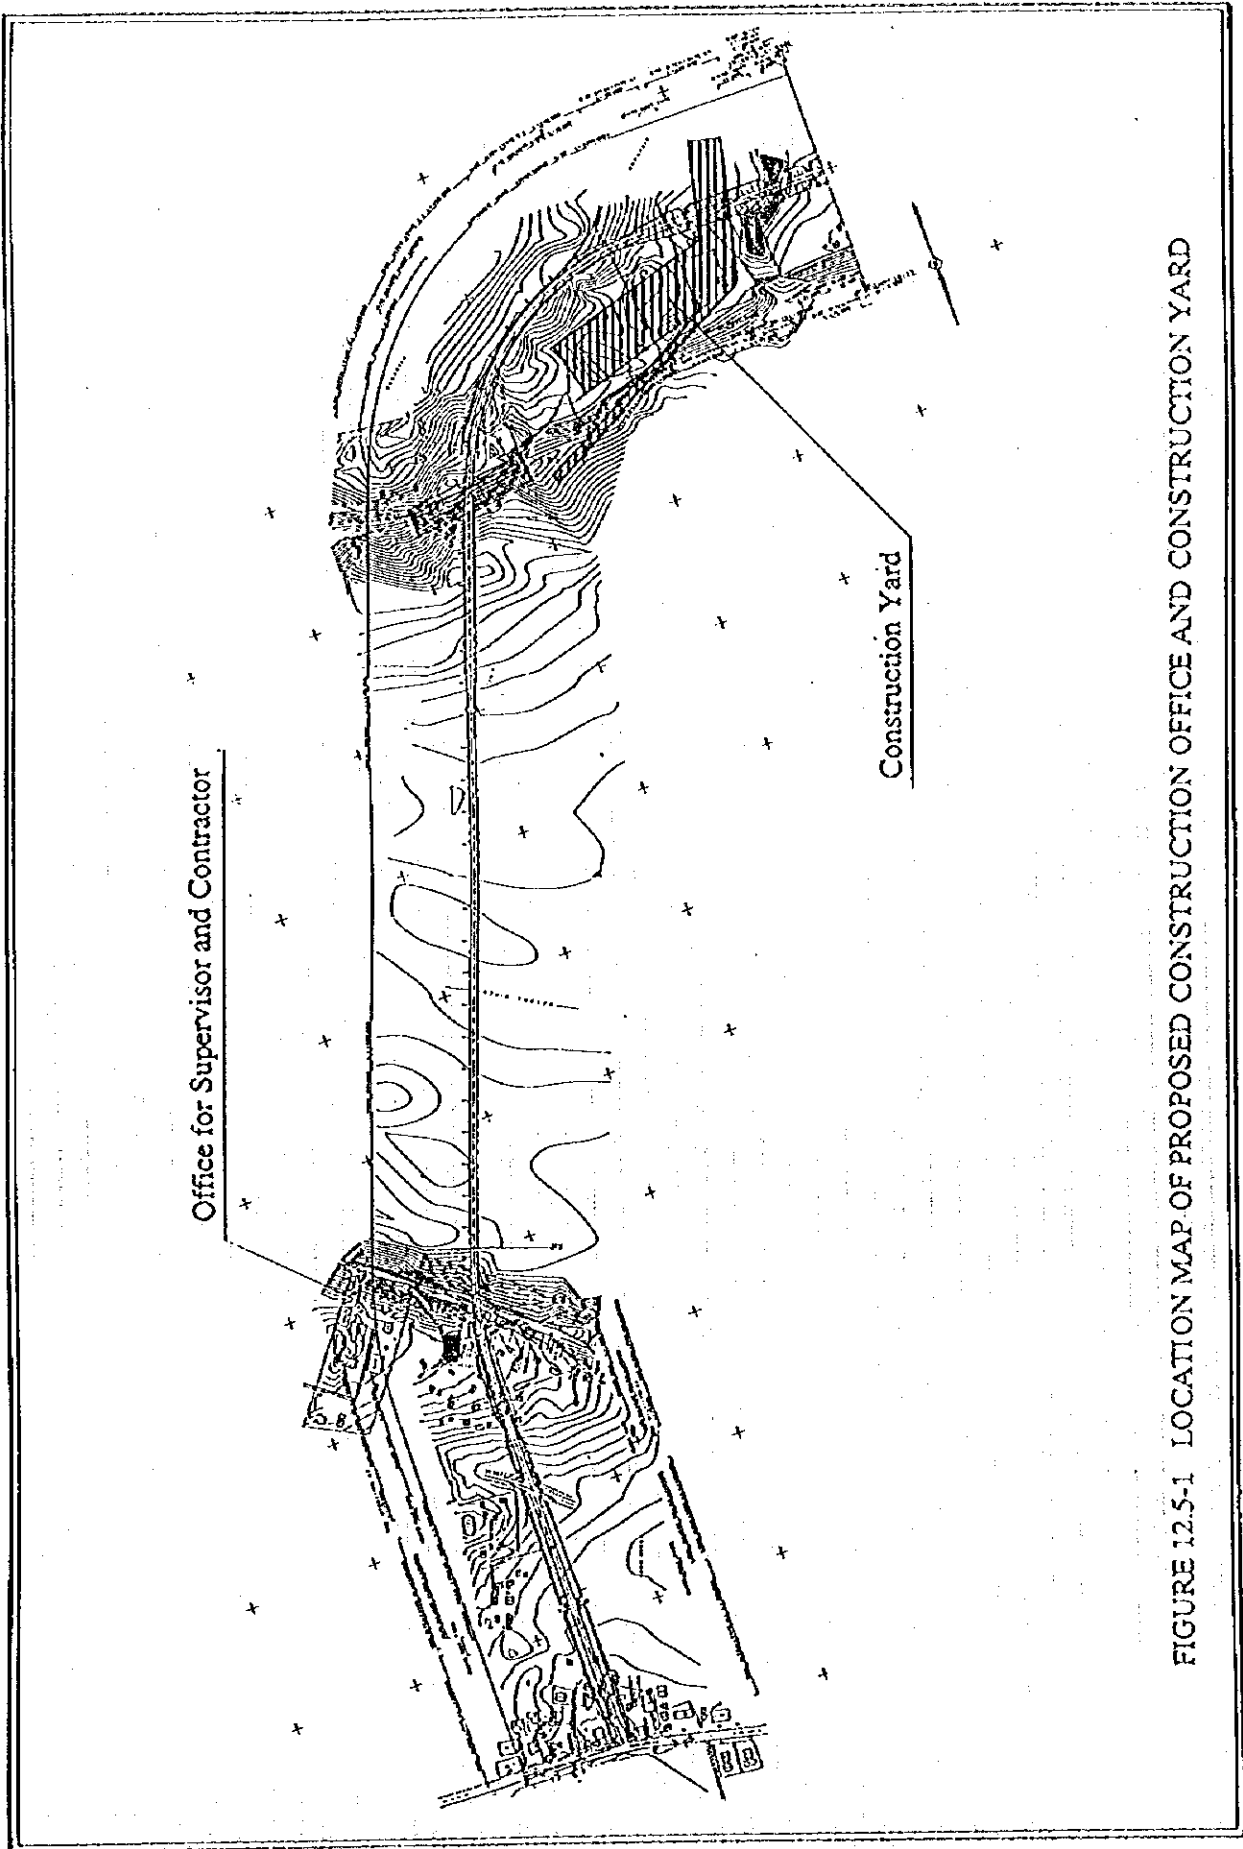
LOCATION MAP OF PROPOSED CONSTRUCTION OFFICE AND CONSTRUCTION YARD
